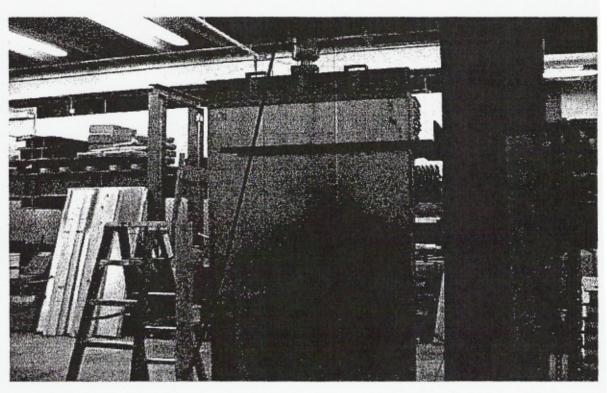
Test Setup for Compressive Loading 8' Galv.-Galv. Panel
